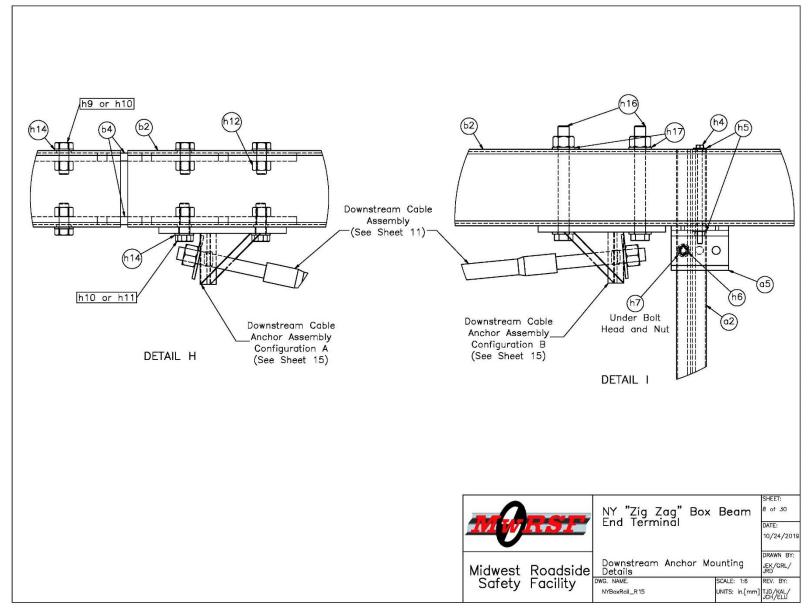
Downstream Anchor Mounting Details, Test No. NYT-1
